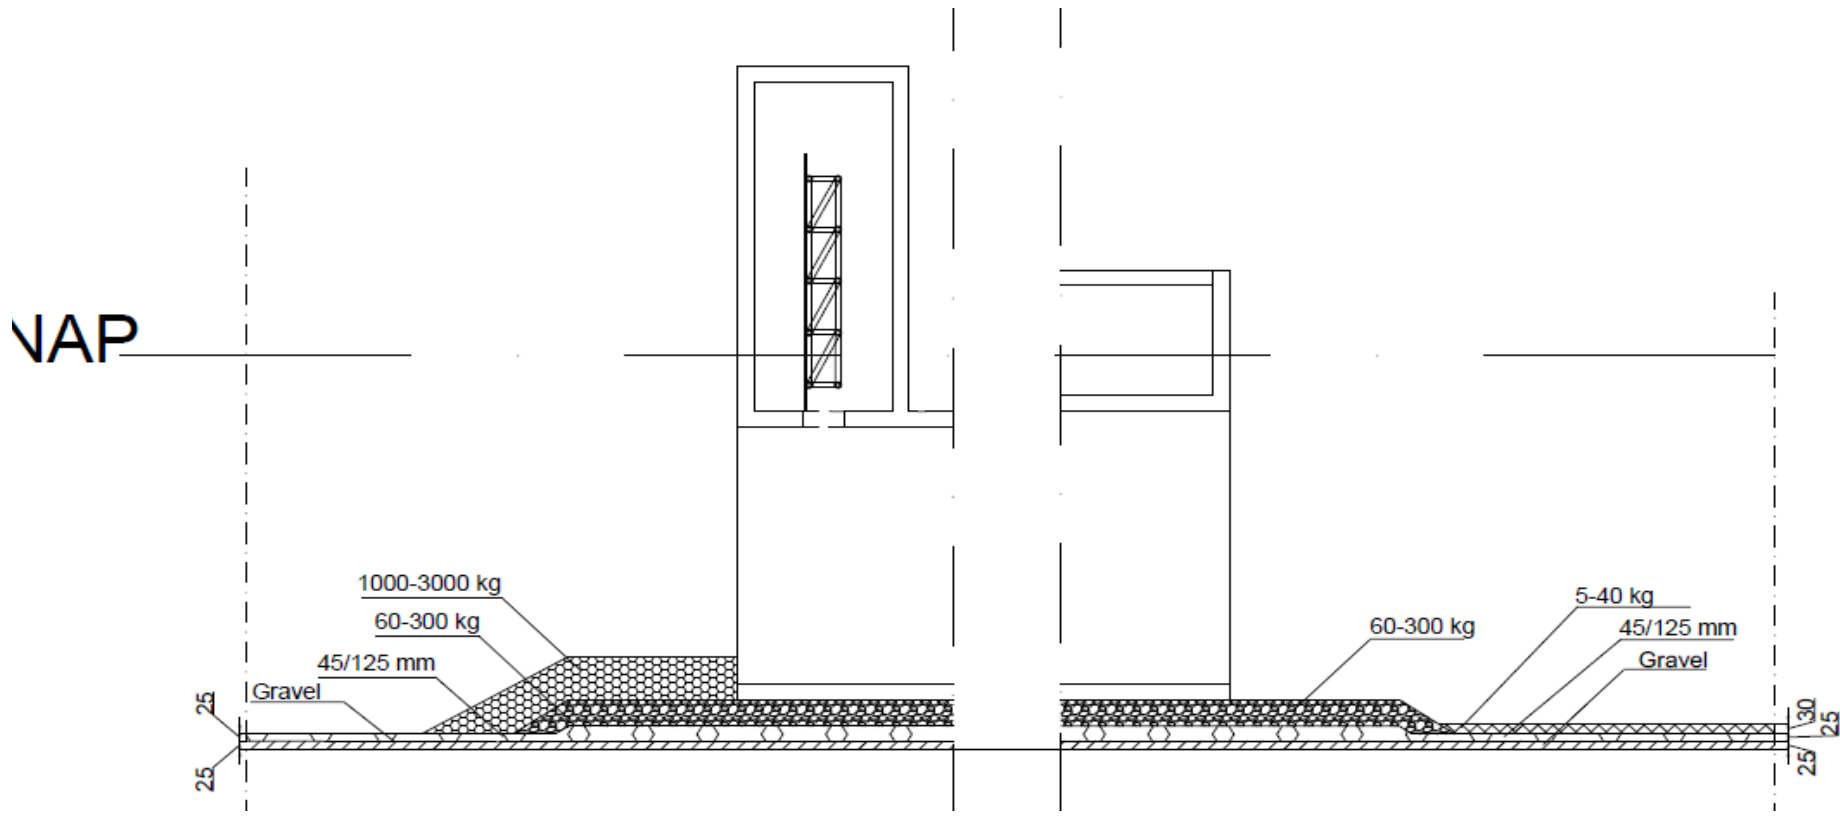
CROSS-SECTION BED PROTECTION AND RUBBLE FOUNDATION BED
